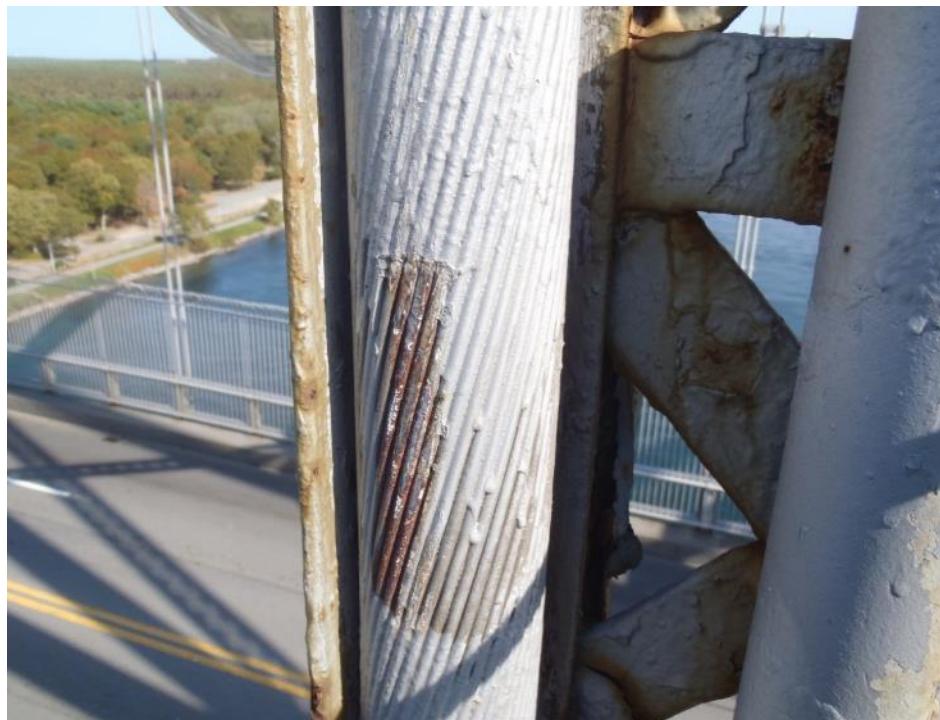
Bourne Bridge, North suspender at west truss joint 13: Area of stage IV corrosion.
